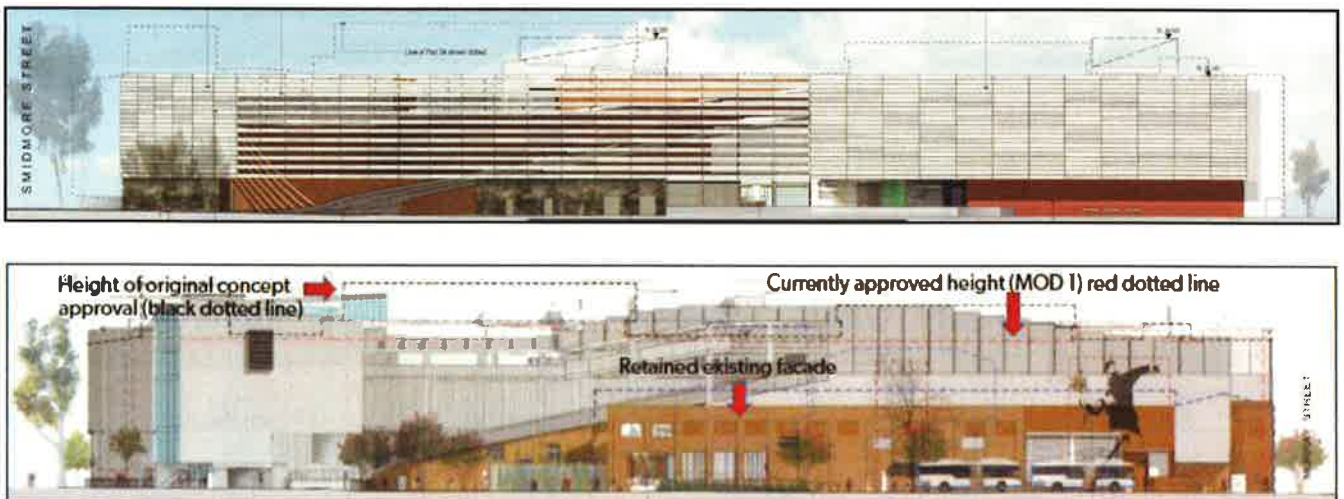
| Edinburgh Road approved south elevation (top) proposed south elevation (bottom) (Source: Proponent's architectural plans).
